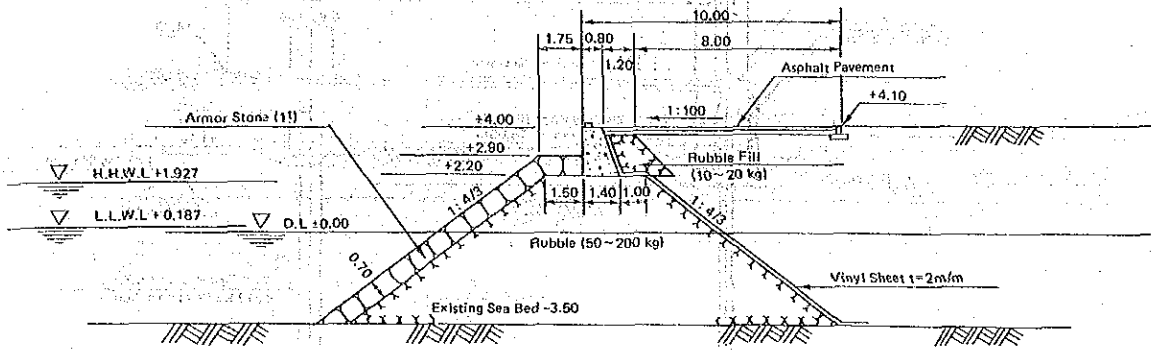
Standard Cross Section of Groin/East Breakwater (II)/West Breakwater (B=4.00)
